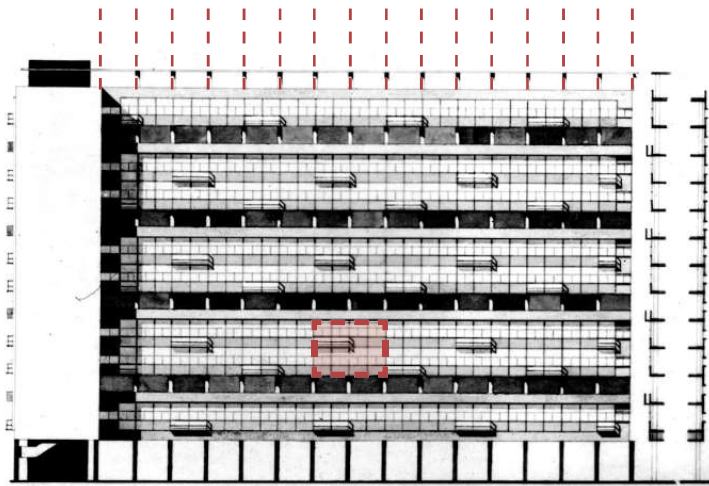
Façade elevation West/East with a cross section on the right side and the chosen apartment to analyse highlighted in red
